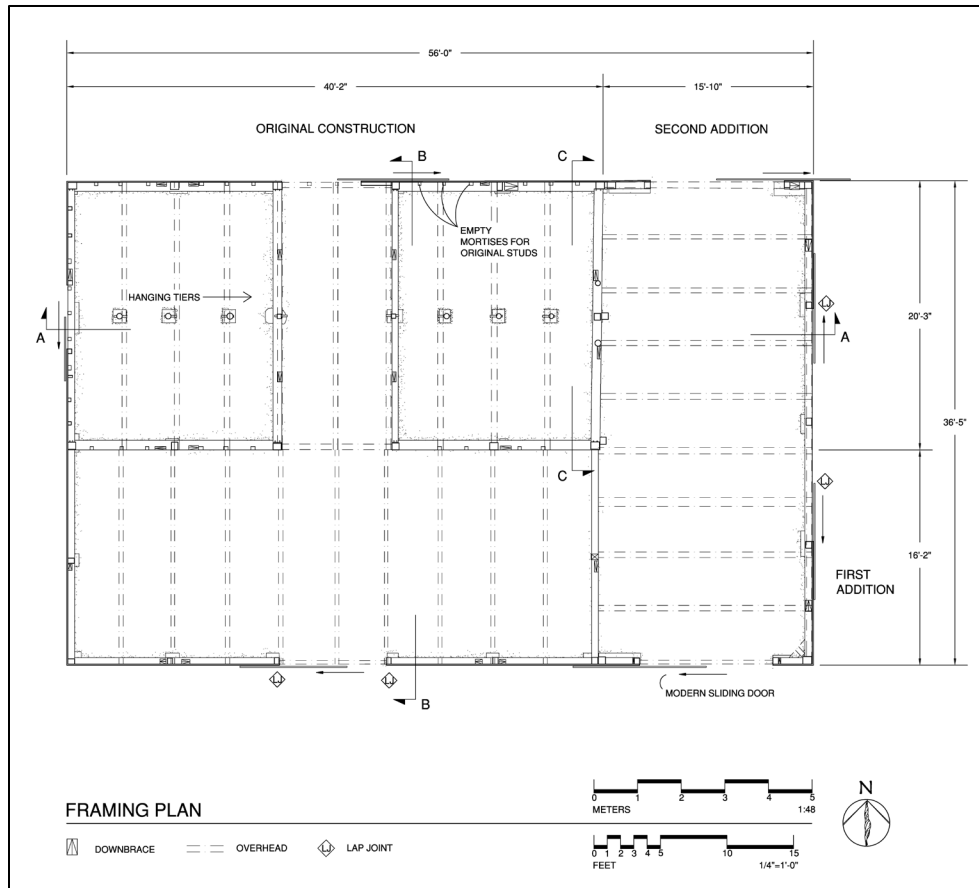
The Spye Park tobacco barn (CH-304) exhibits the centered transverse aisle design, with two fully framed flanking bays and a likely original shed running the length of the south wall (framing plan).
